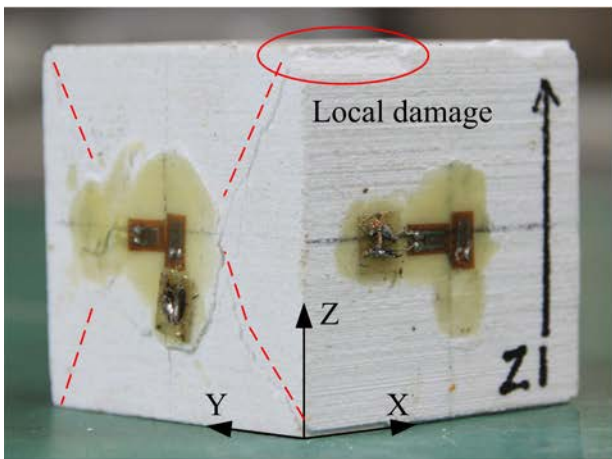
Failure of a typical cubic specimen under compression in the Z direction
